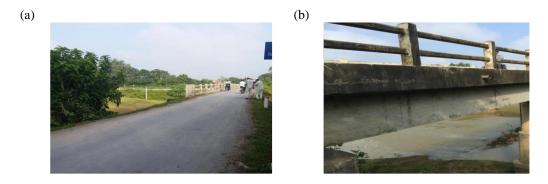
Vang bridge: (a) The top view of the bridge; (b) Downstream side of the bridge
